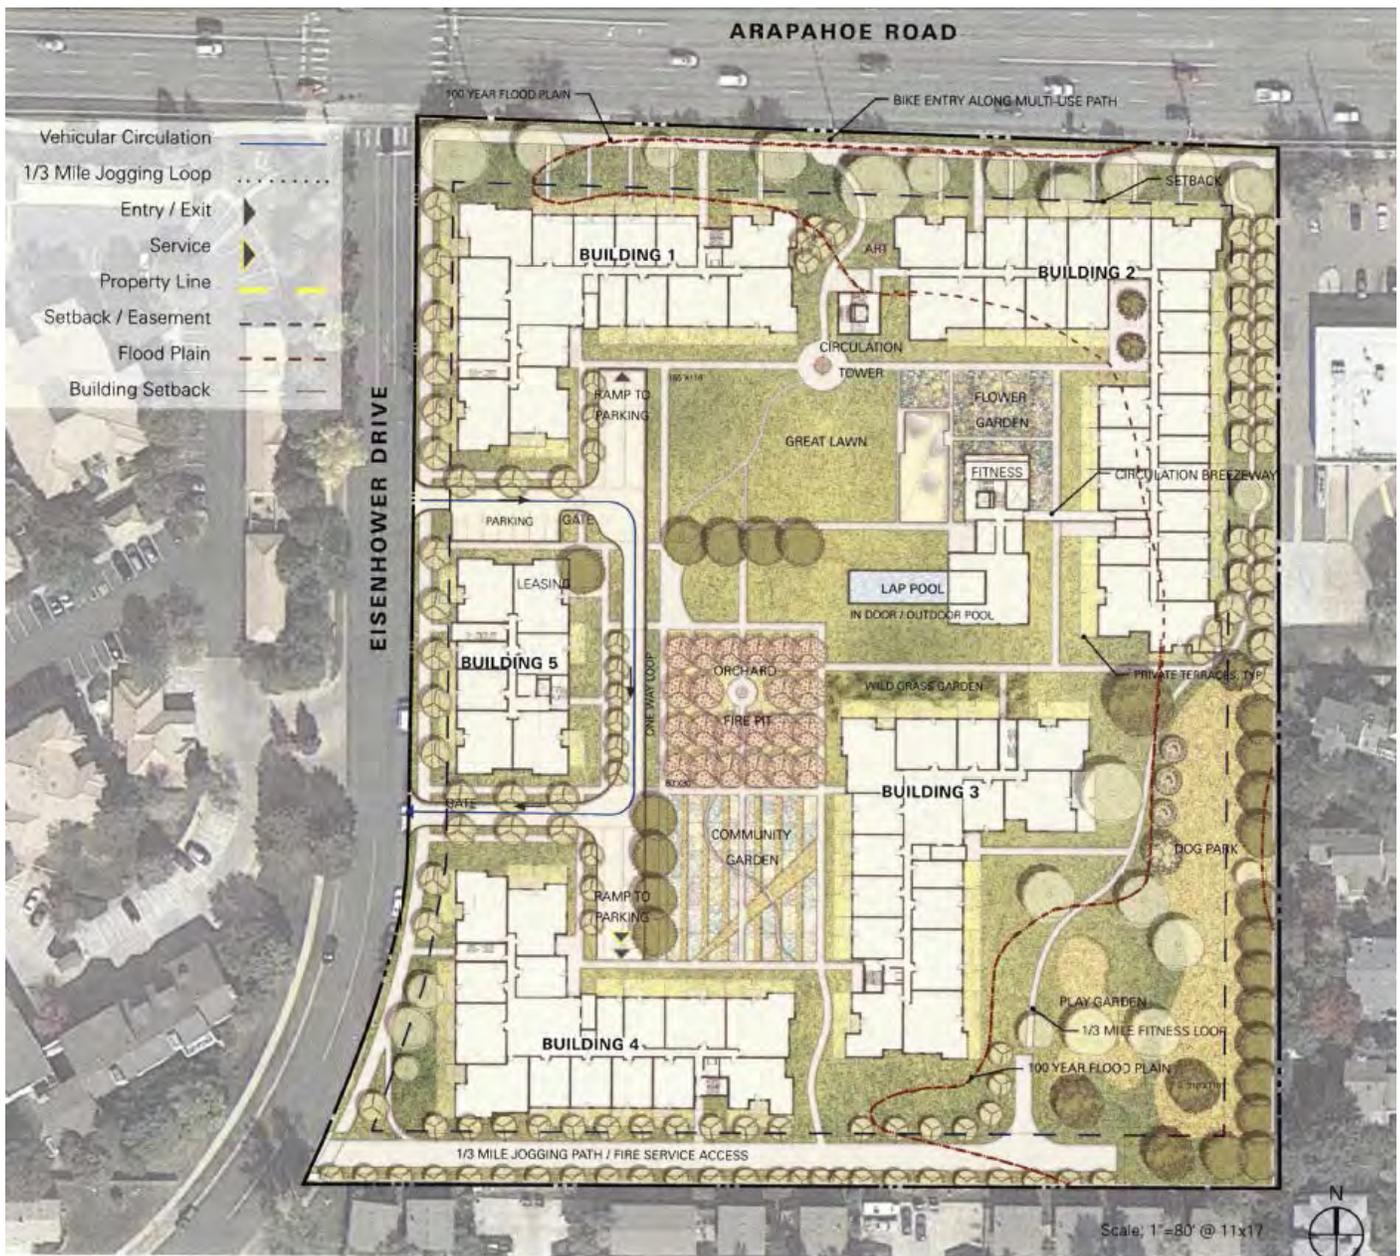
Concept Plan Proposal for Eastpointe Apartment Homes
